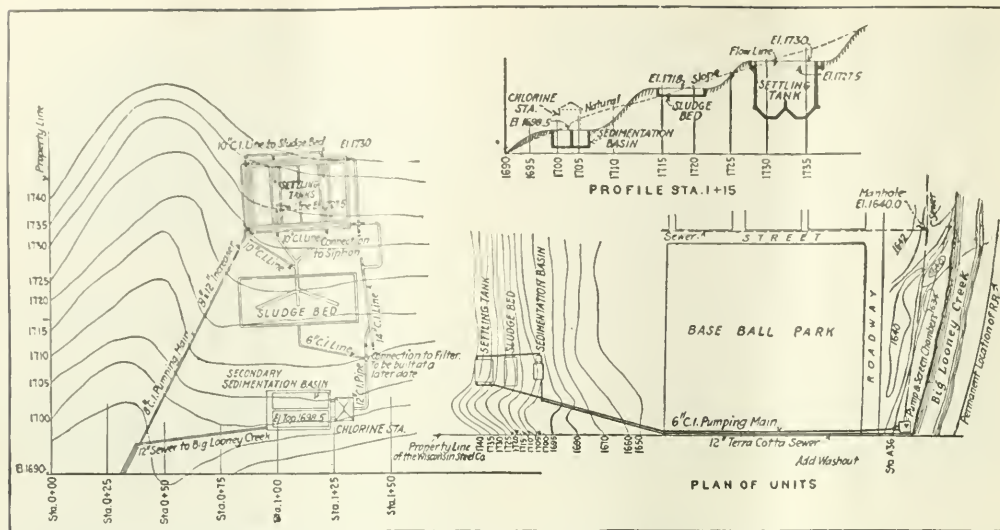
SEWAGE-DISPOSAL PLANT SET ON EDGE OF TOWN BY BASEBALL PARK
